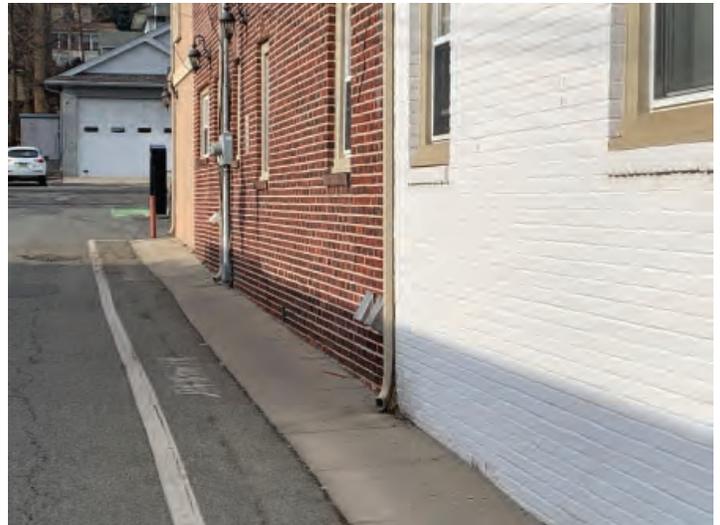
Downspouts opening onto 19-foot wide driveway on Lot 37 (aka Franklin Terrace), south of Lot 36.
